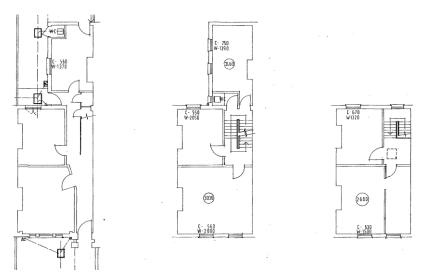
Original floor plans courtesy of LBC website - Not to scale
